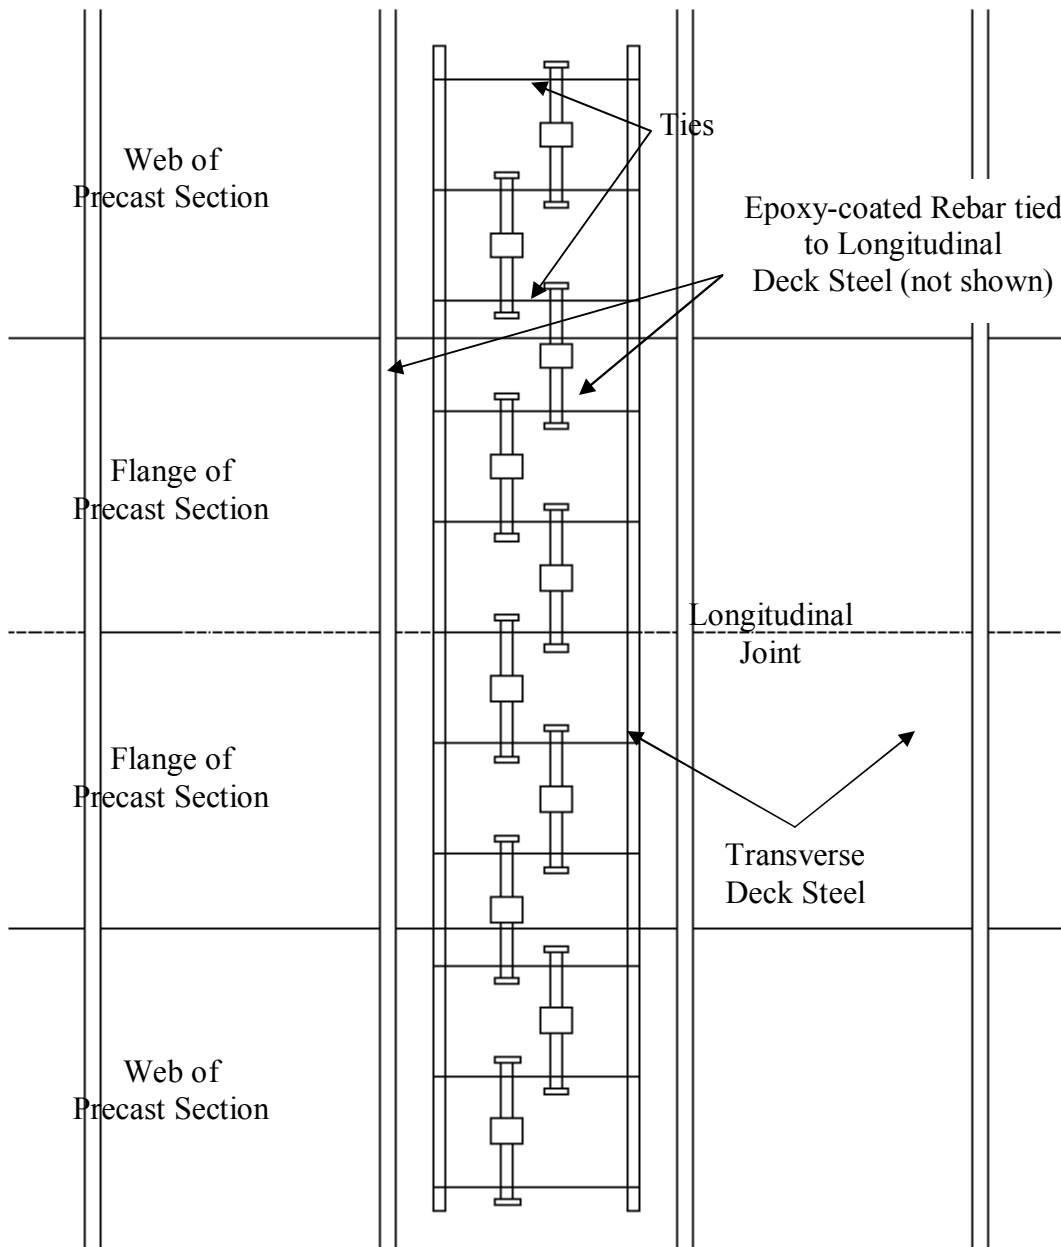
Plan view of instrumentation detail for VW embedment strain gages located directly above the precast section web corners
